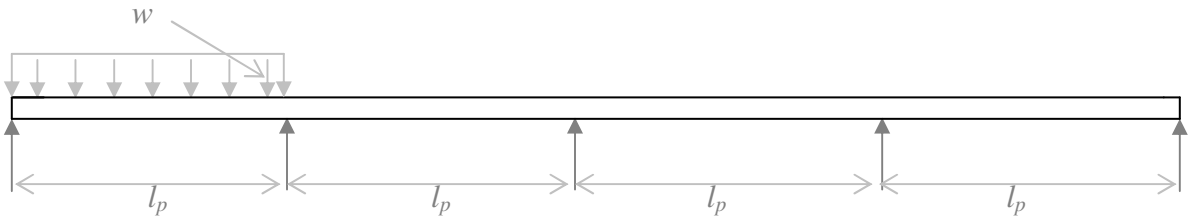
Load arrangements for maximum deflection of the profiled steel sheet.
